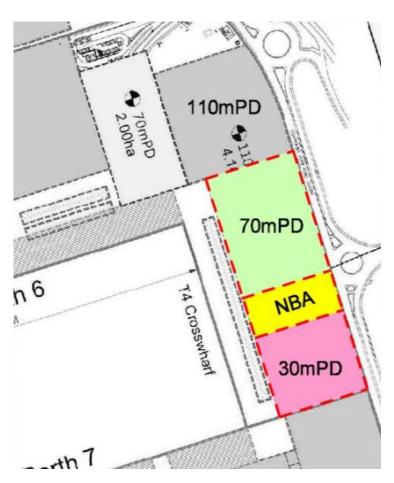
Layout Plan for Further Revised Scenario C at T4 Crosswharf
